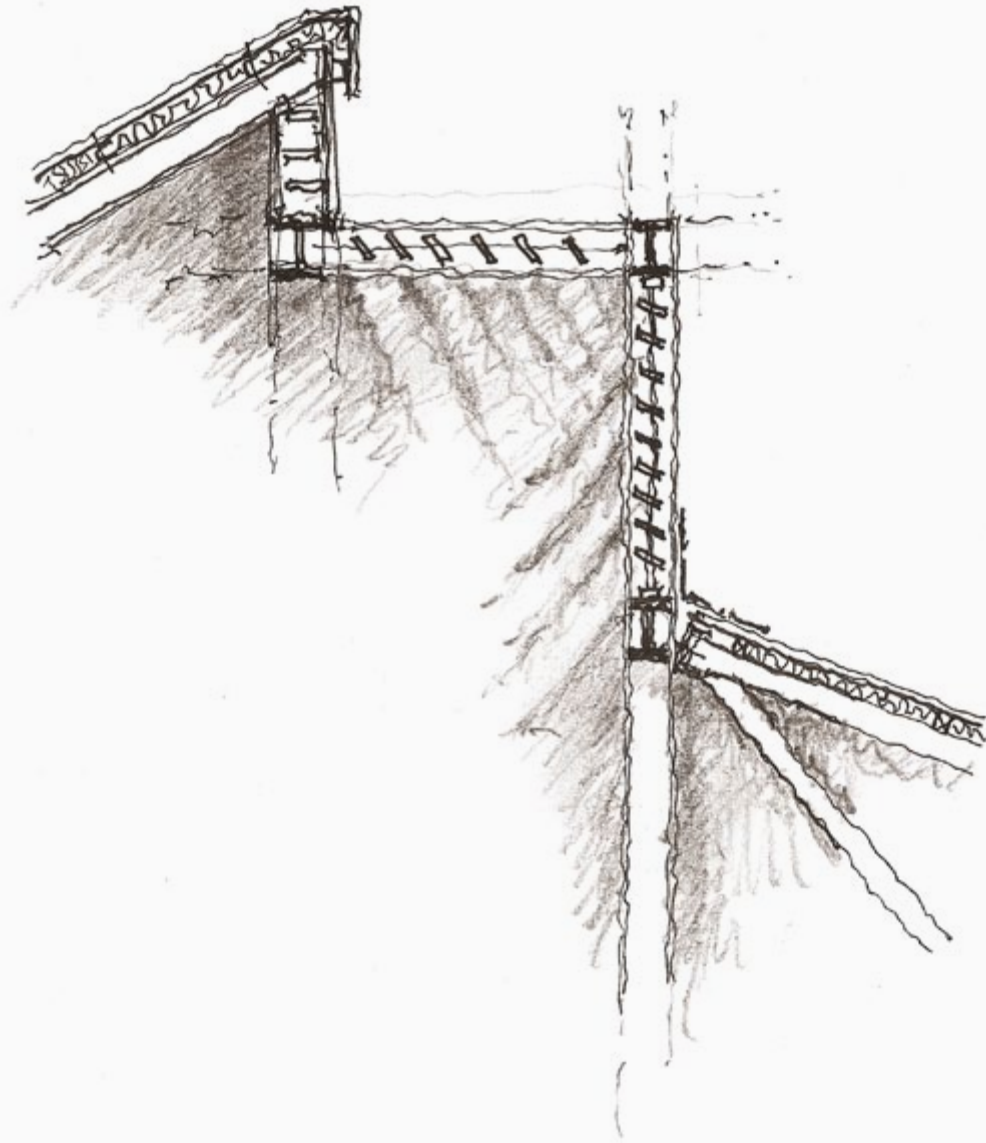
Detail of the mediating connection between the new & existing structure - plan (Author: 2012)
